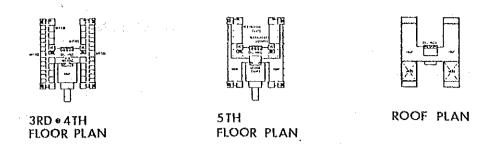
FIRE EXTINGUISHING AREA (2) (CO2, SPRINKLER & FOAM DISCHARGING SYSTEM)
